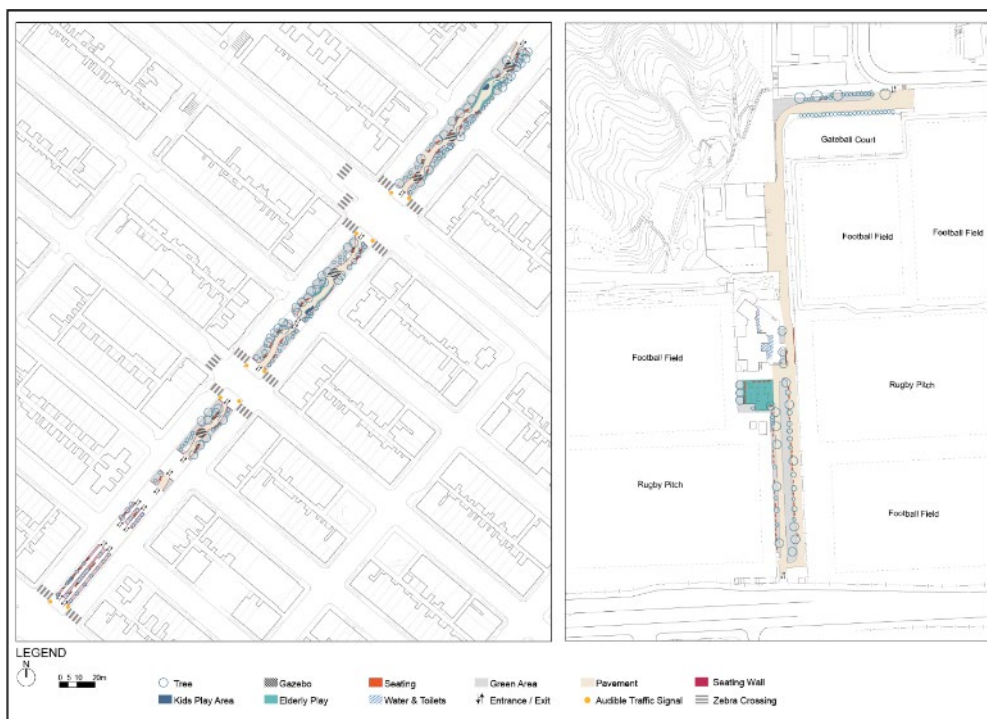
Map of Nam Cheong Street Sitting Area No.2 to No.5 (left) and Tai Hang Tung Park (right)
